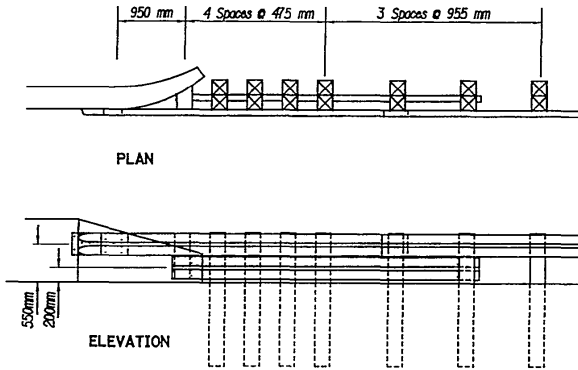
Flared Concrete Bridge Railing with W-Beam Approach Rail/Rubrail
